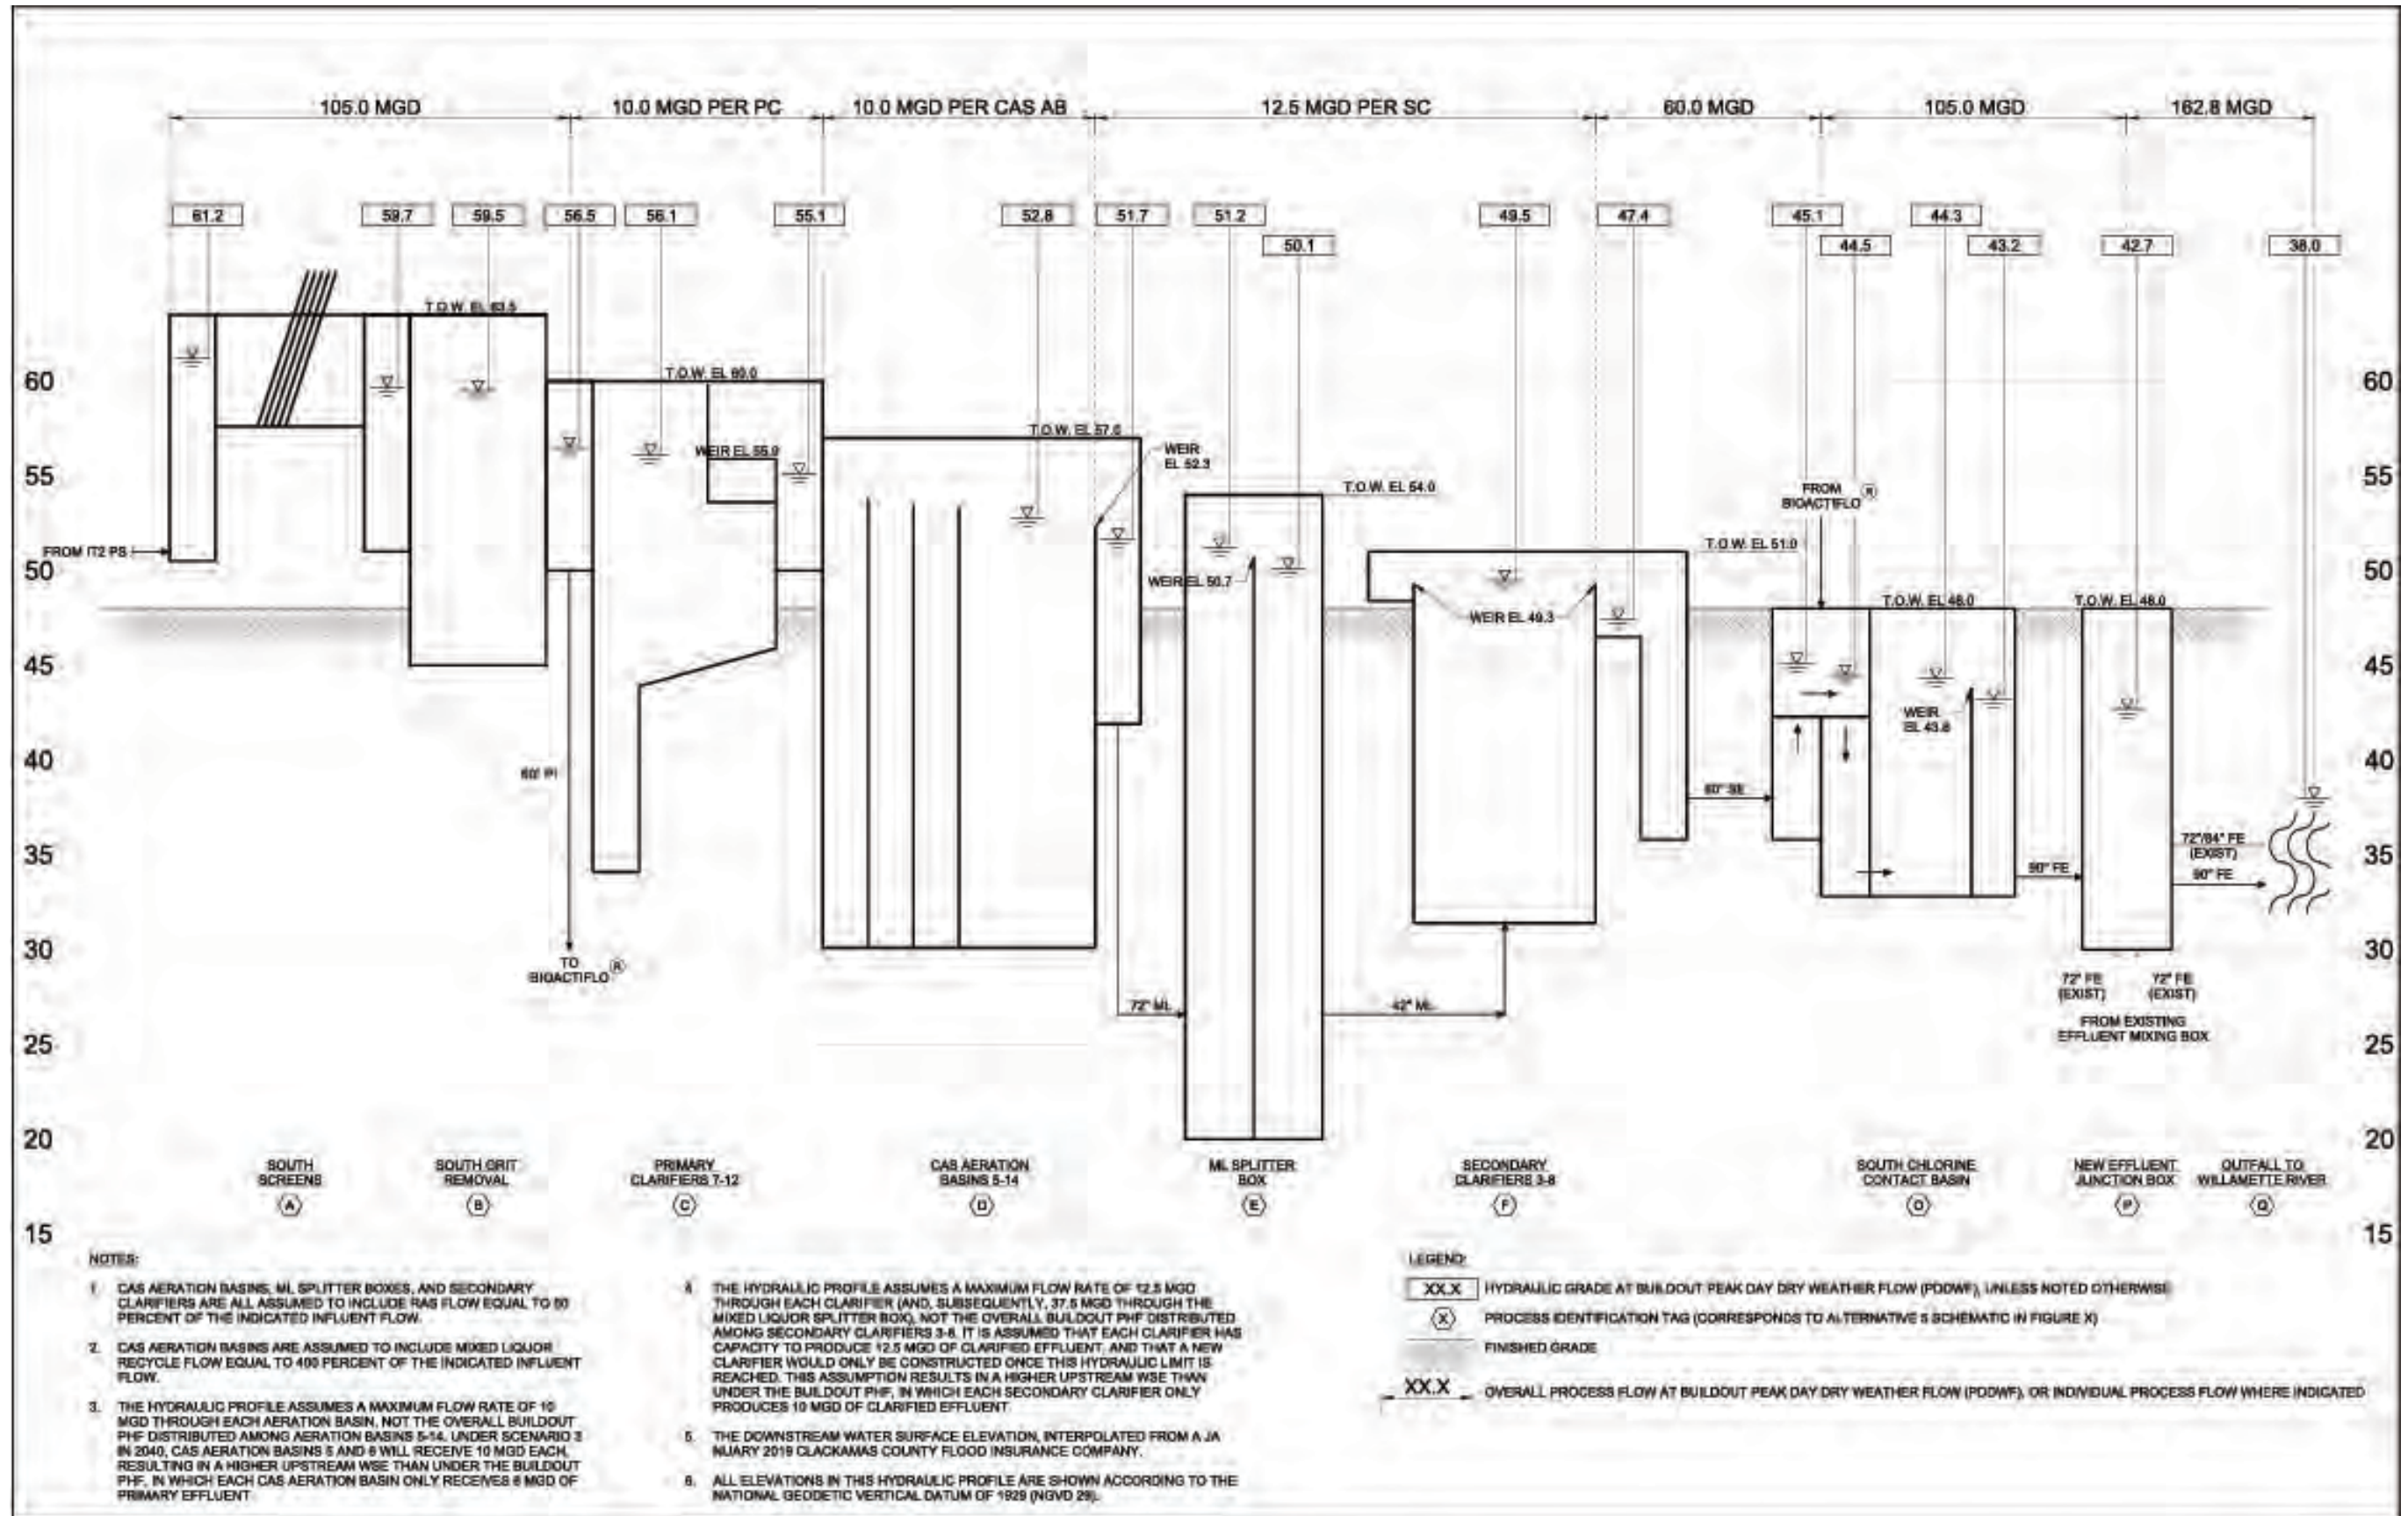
Tri-City WRRF Recommended Alternative South Plant Hydraulic Profile
